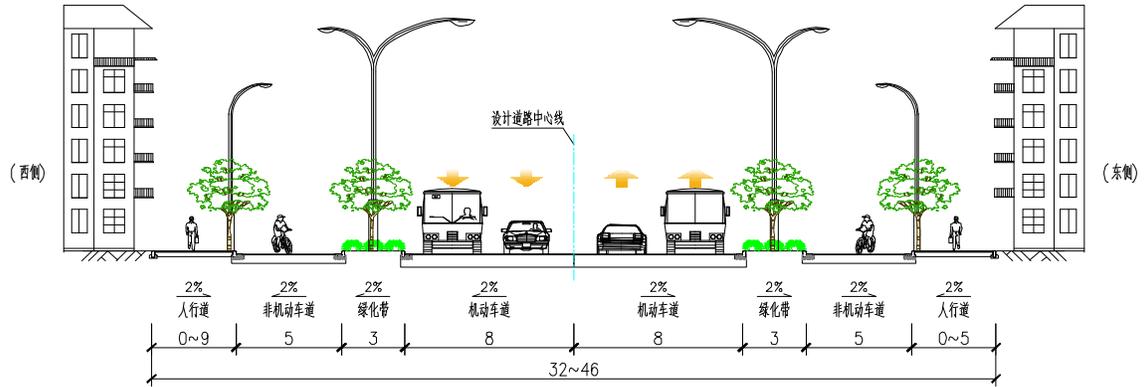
Current profile for North Outer Ring Road □ Taihang Street
